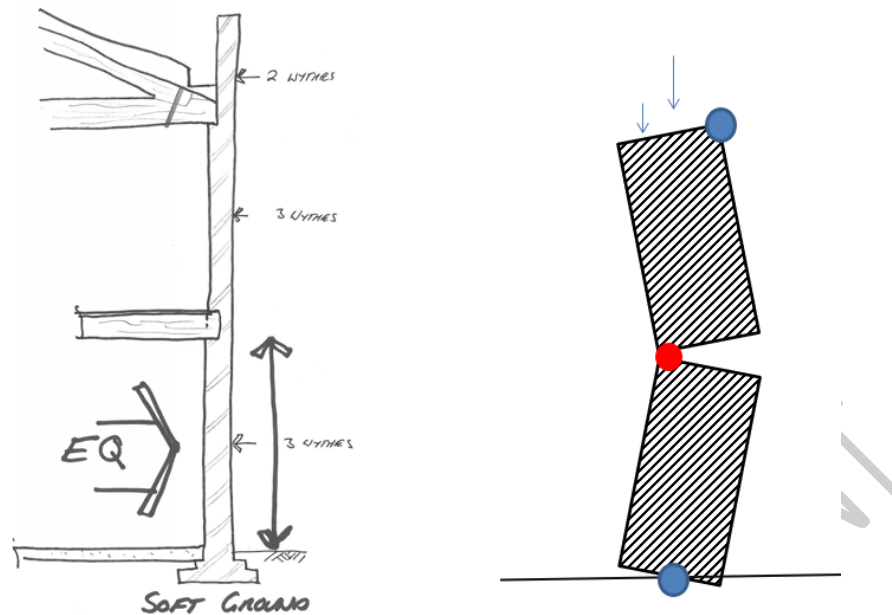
B.27: Boundary conditions for lower wall with upper wall and parapet above, soft ground
